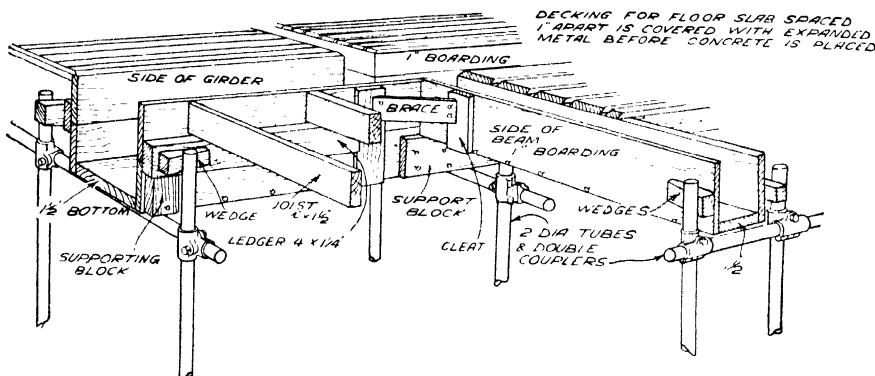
FORMWORK AT JUNCTION OF GIRDER AND BEAM AT C IN FIG. 1
